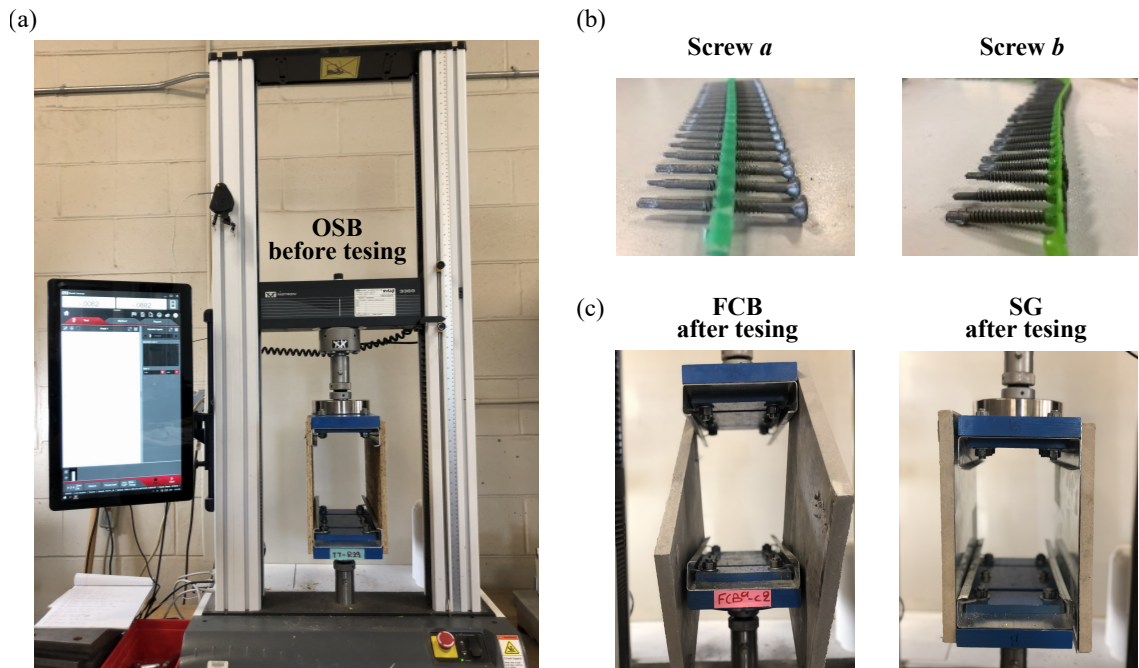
Experimental connection test configuration and components. (a) Test rig and stud-screw-sheathing specimen located in INSTRON machine before testing. OSB sheathing is illustrated in the photograph for representation. (b) Examined self-drilling screw types indicating the screw length, head and thread differences between screw *a* and *b*. (c) Pictures of actual specimens (FCB and SG) after testing illustrating the failure of the connections either due to screw pull-through or shear screw failure.
